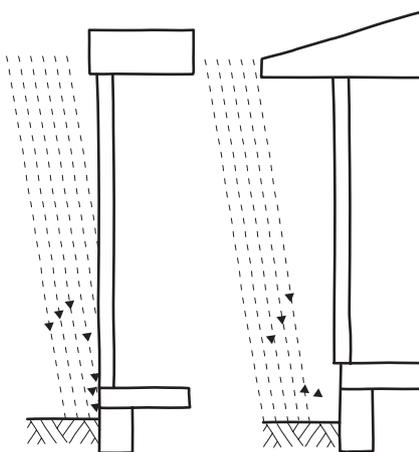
Protection afforded by roof overhangs; avoid extending timber cladding into splash zones
